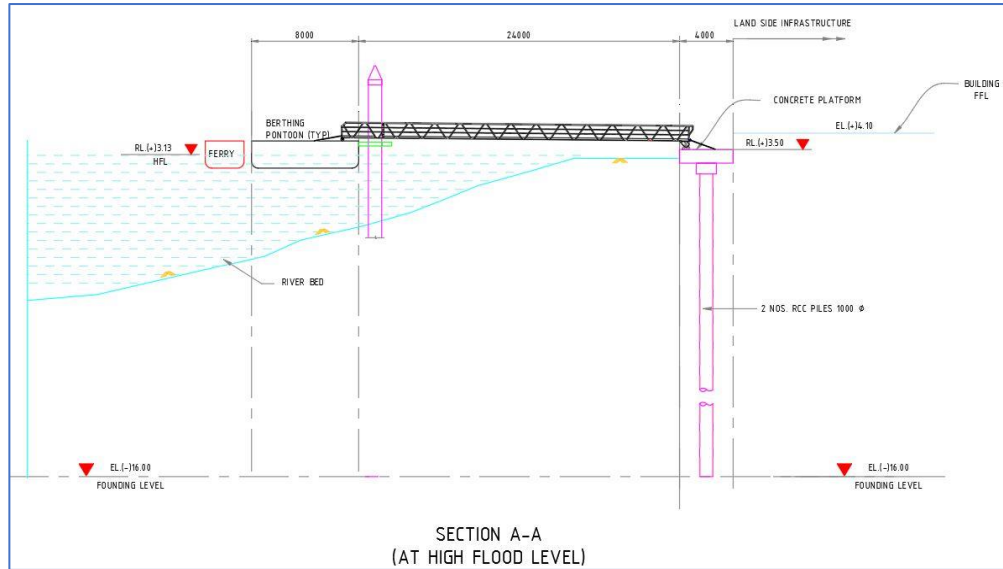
General arrangement of berthing pontoon at High Water Level
